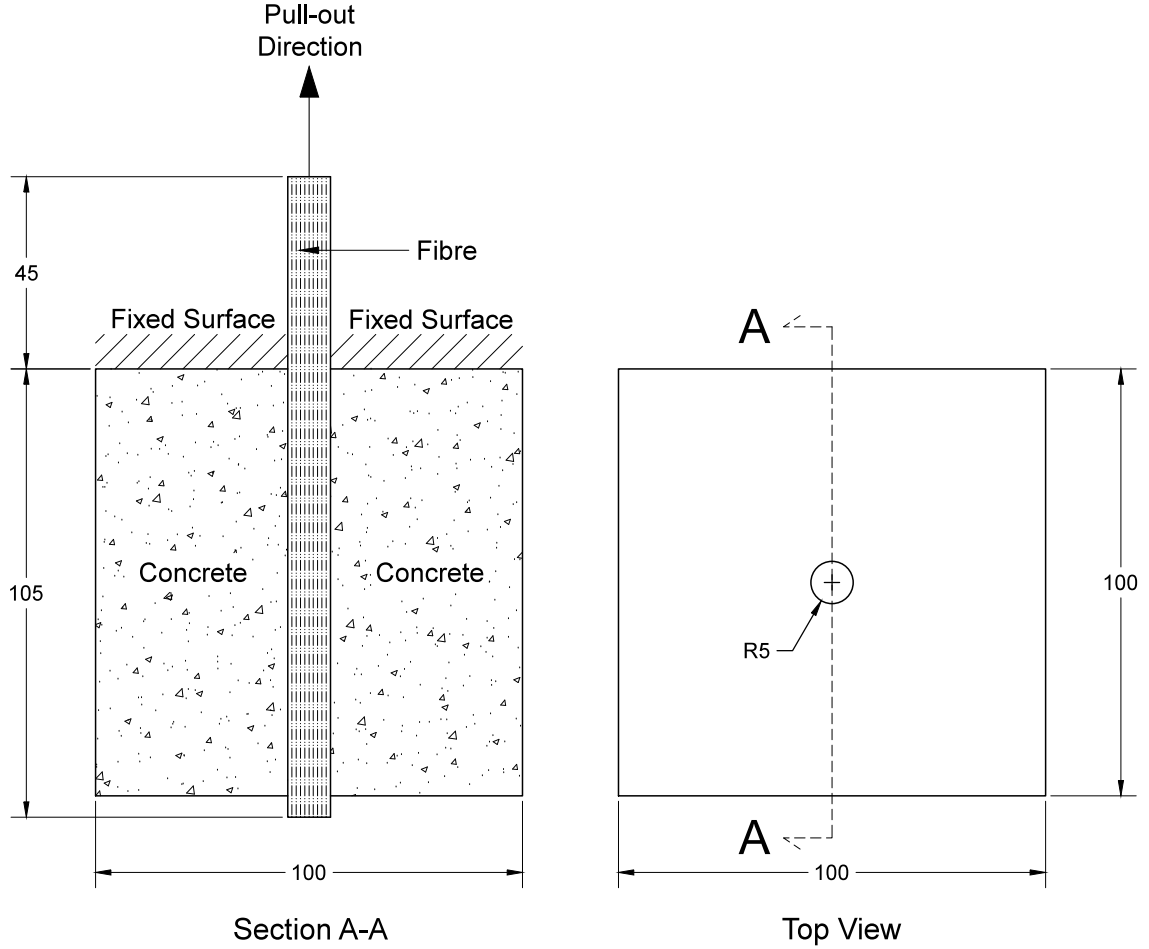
Pull-out model of fibre strand embedded in concrete
